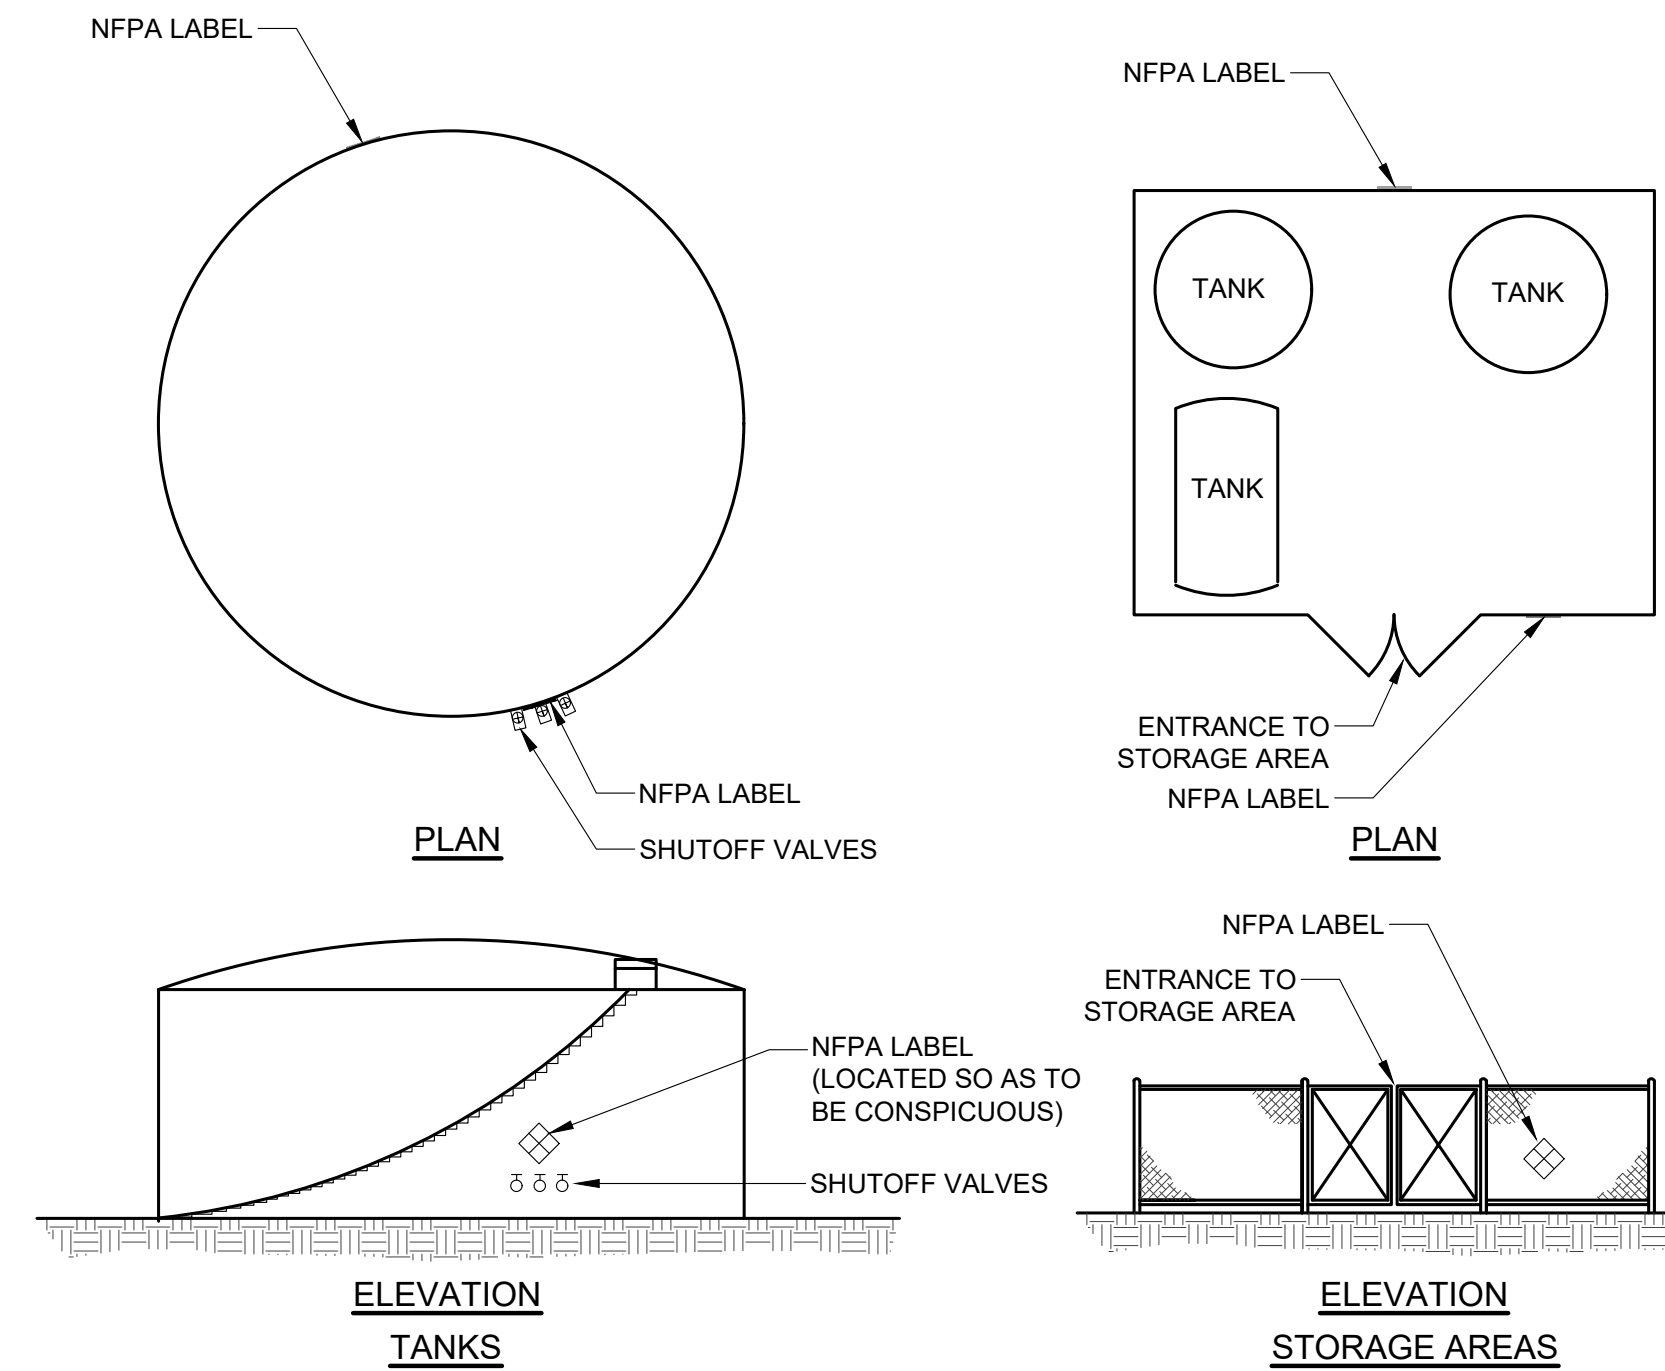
TYPICAL NFPA LABELING DETAIL
